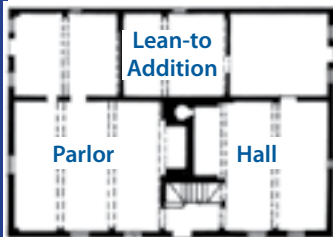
A typical New England saltbox features a steeply sloping roof to shed snow and a floor plan organized around a central chimney to conserve heat.
